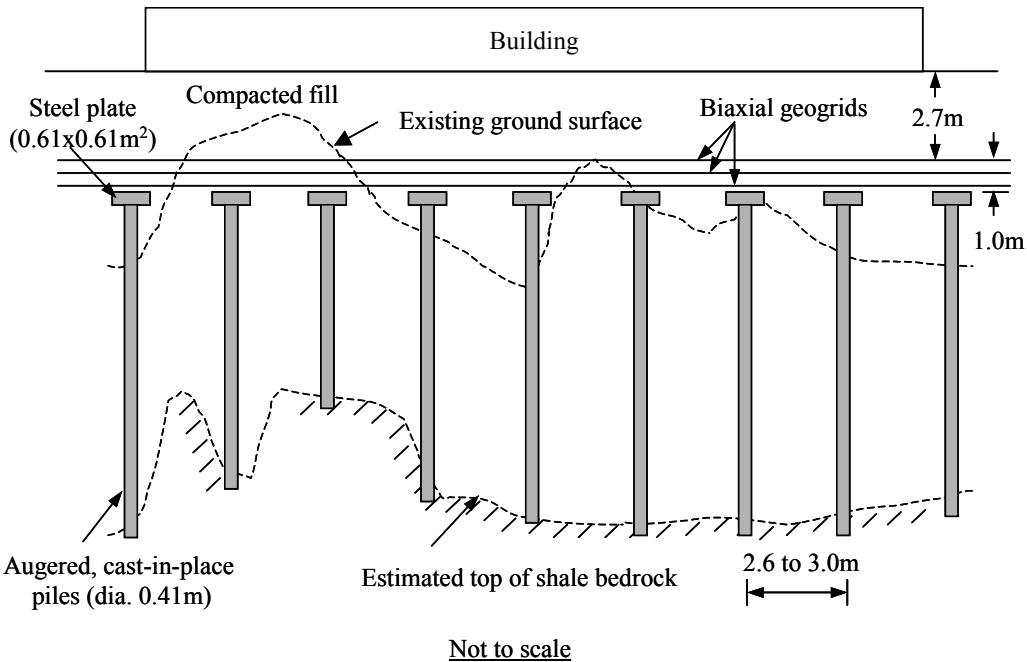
A Building on the GRPS System (Han and Akins, 2002)
